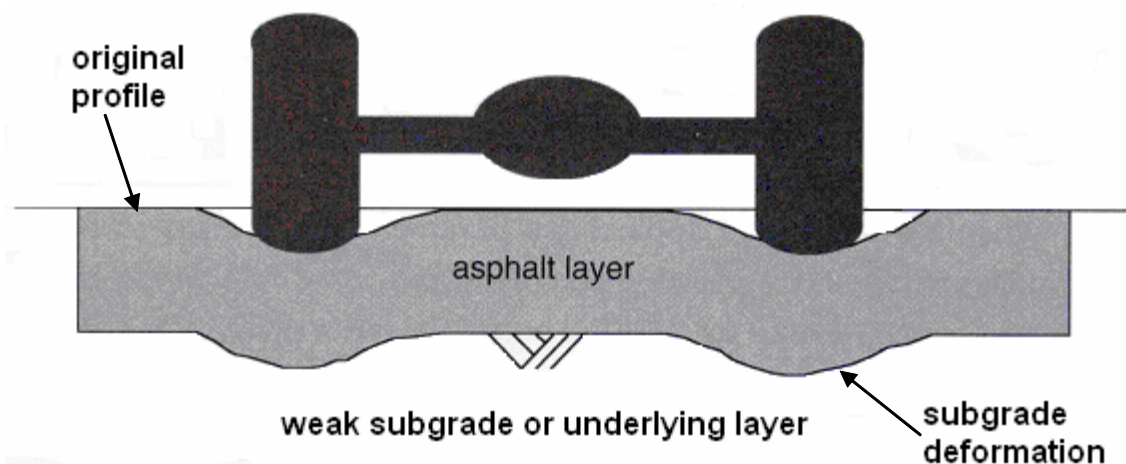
Rutting of Underlying Pavement Layers (after Asphalt Institute 1996)
